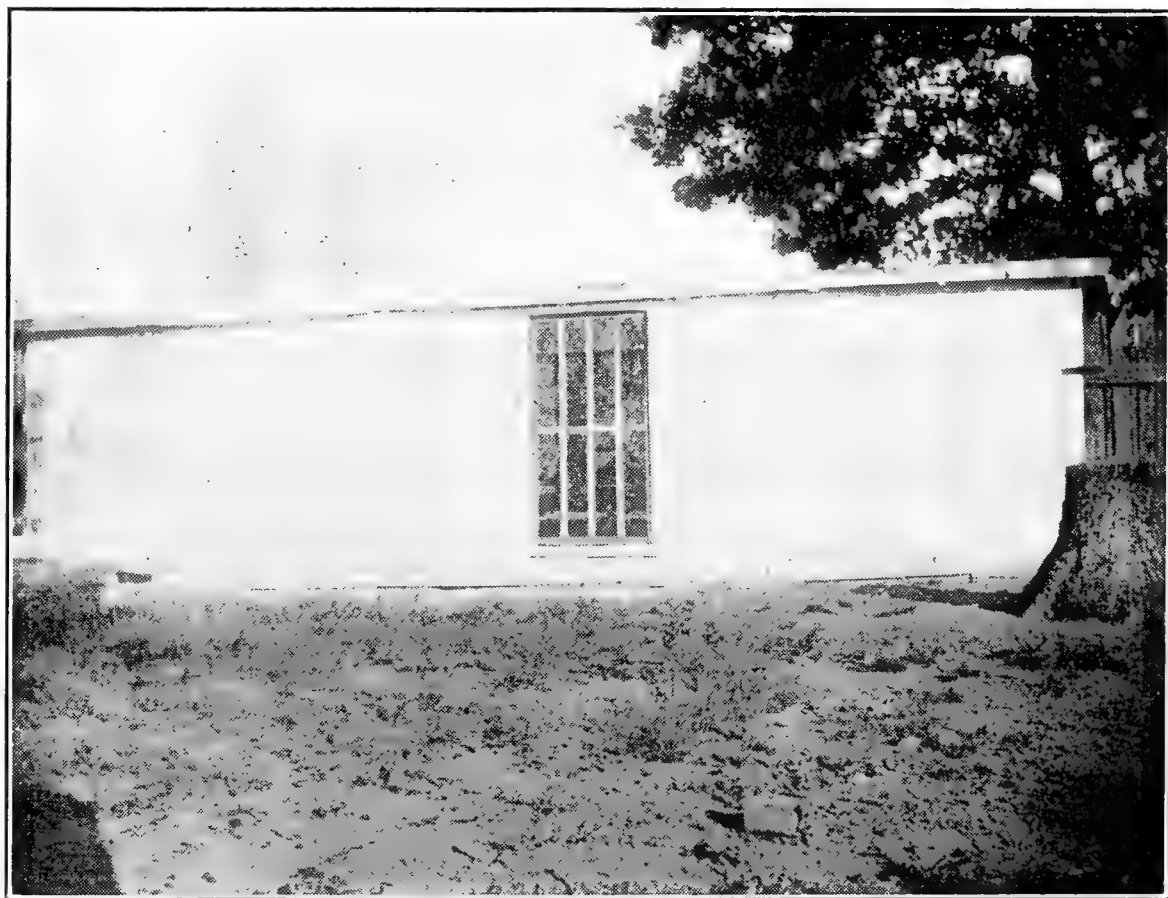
Brooder house. It is unwise to attempt to raise chicks by artificial methods without suitable house room. Figure 10 shows one section of a house for this purpose. This house is 40 feet long by 12 feet wide. Has two large glass windows in South side with drilling cover or shade on inside. This house is built like Fig. 1 in every respect, excepting front, which is boarded tight, and windows instead of open front. The inside of walls are covered with heavy building paper to make it warmer. Such a house will accommodate three of the brooders shown in figures 11 and 12, and 1,000 chicks have been kept in this house until three weeks old.
